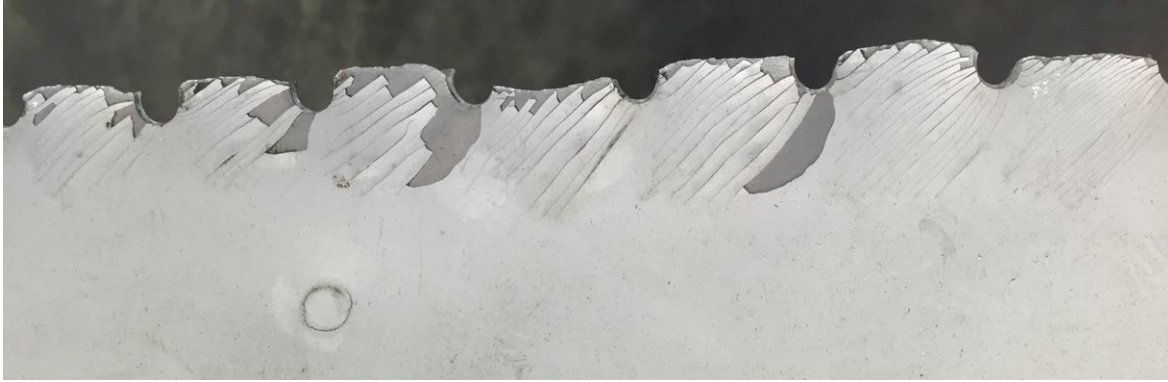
Paint cracks indicating a combination of tension and shear loading. Net-section failure with indication of tension and shear, the paint cracks perpendicular to the resulting loading. (Source: Dutch Safety Board)
